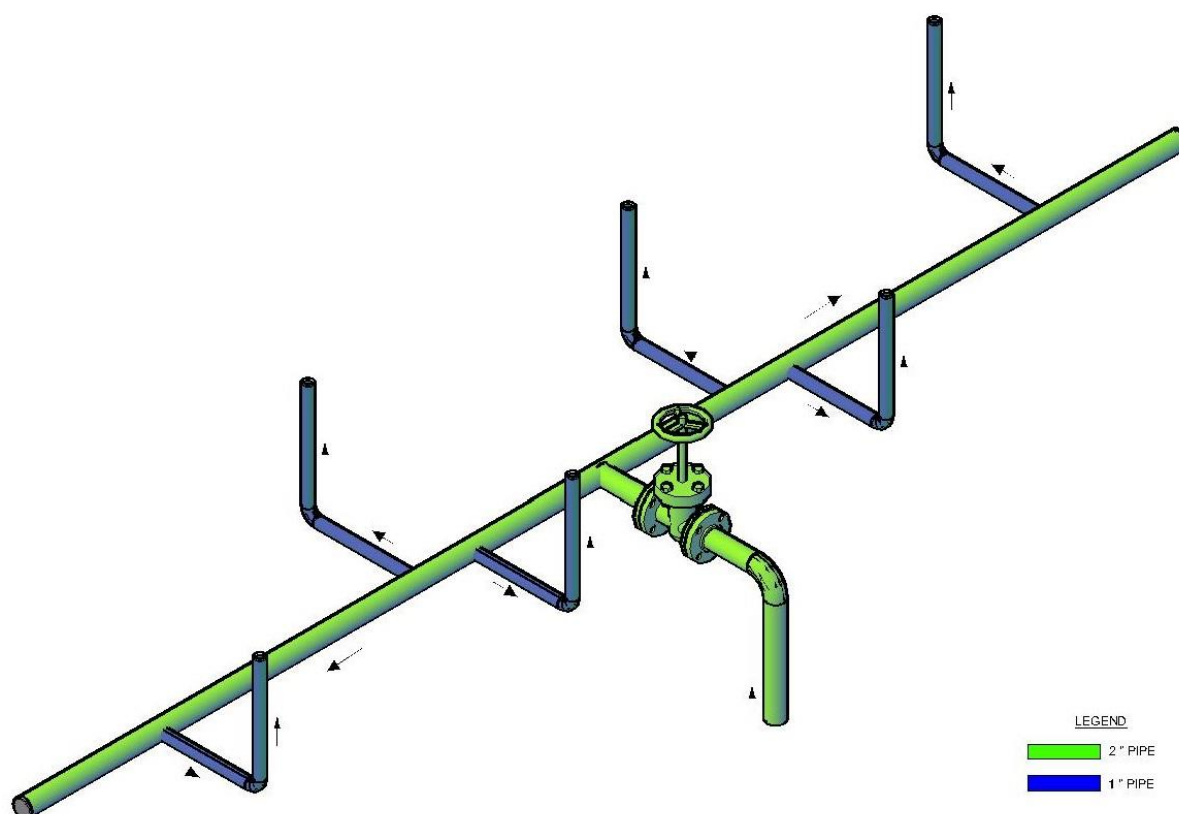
Isometric drawing of steam injection system to the mud trough of the rotary vacuum filter
